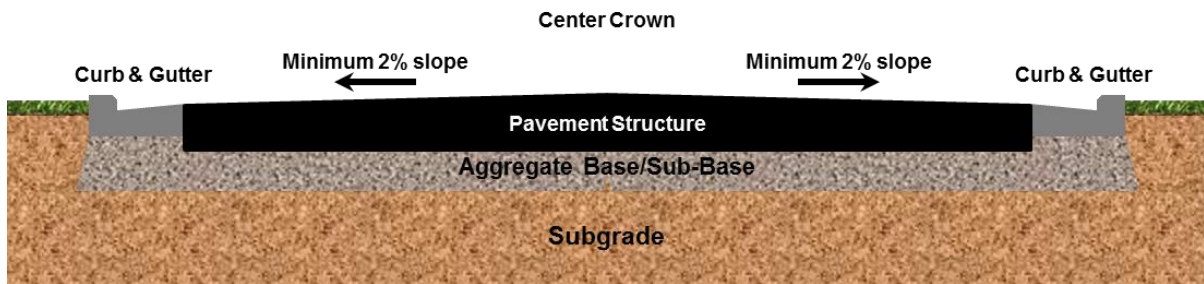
Cross-Section of Parking Lane (Urban Roadway)
